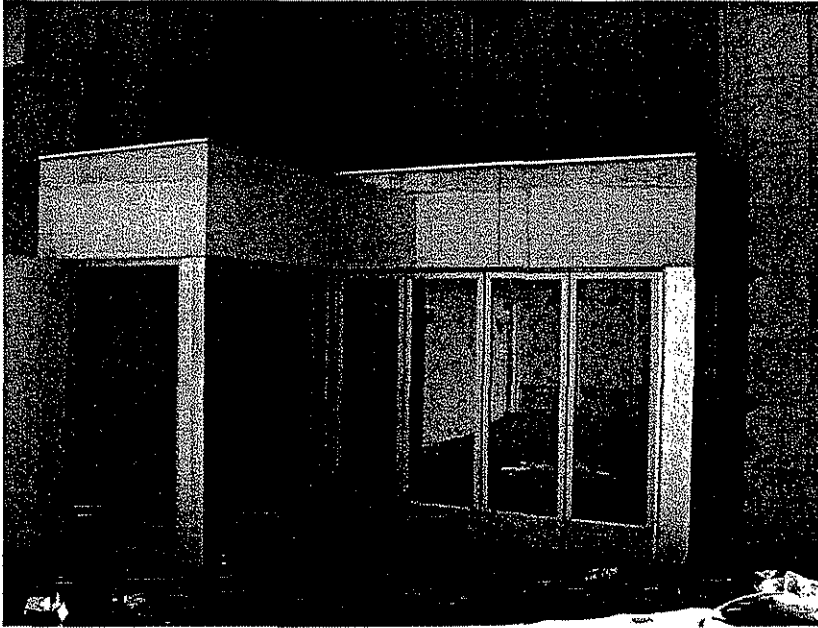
Photo K: Enclosure of the stairway leading from 12th floor residential unit to the roof/pool level. The intention was to nestle this enclosure as much as possible behind, and between the buttresses of the tower.
